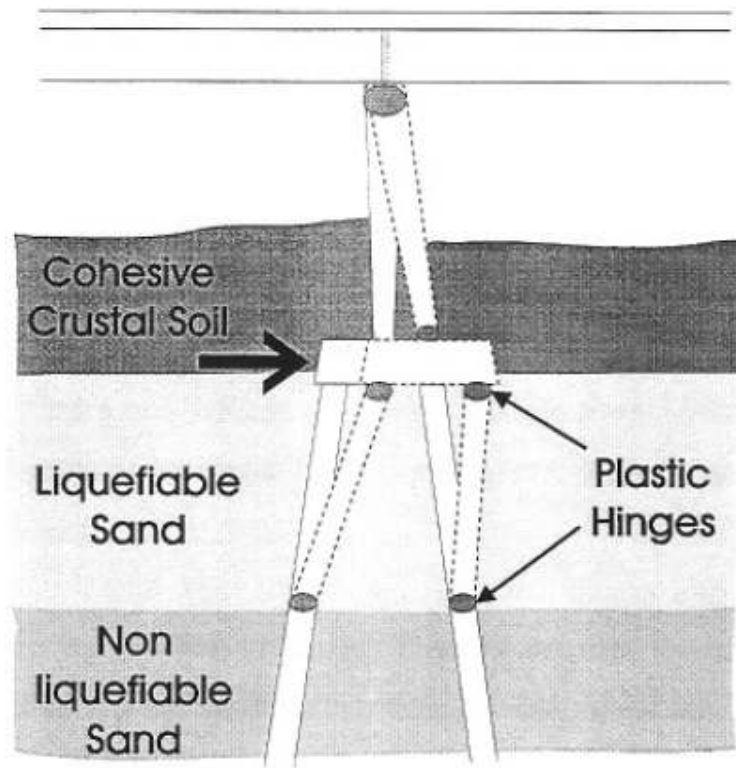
Potential Collapse Mechanism for Landing Load Bridge (Keenan, 1996)
